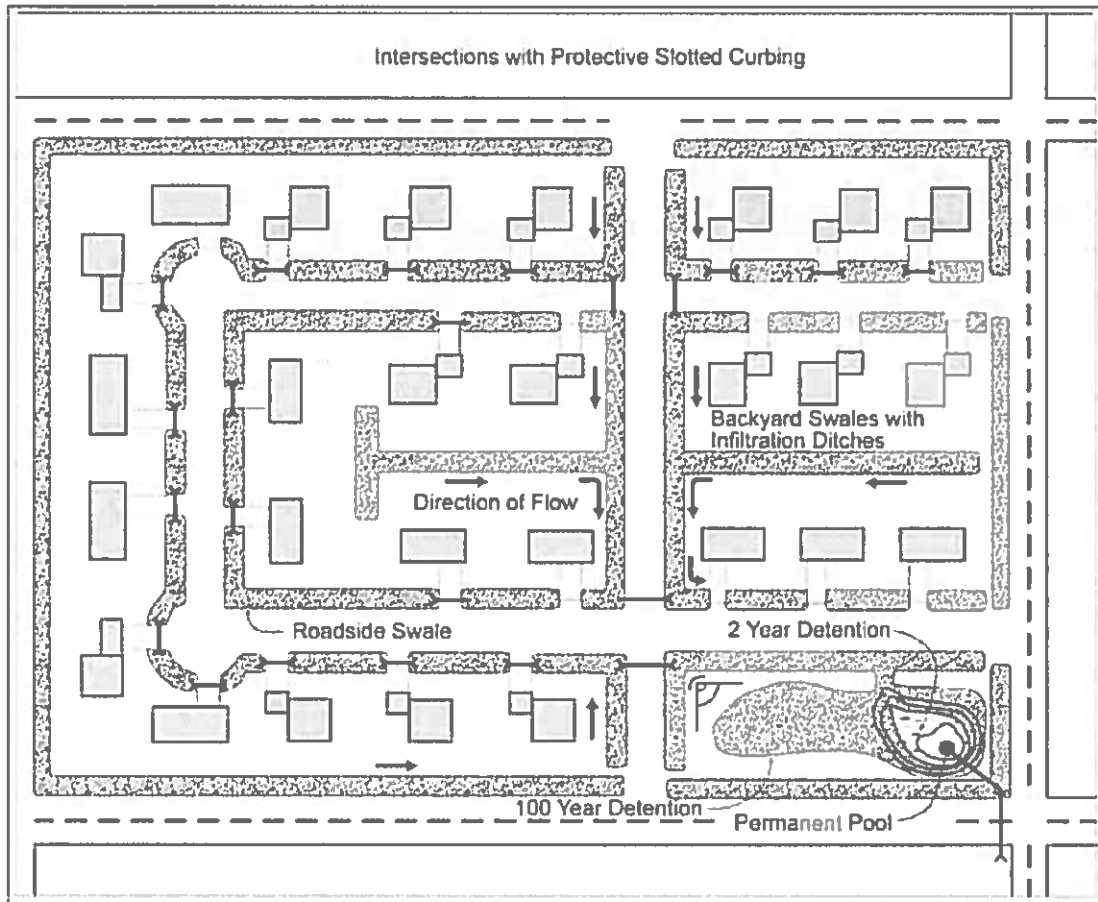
Sample Plan of Subdivision Illustrating Grass Drainage Swales
